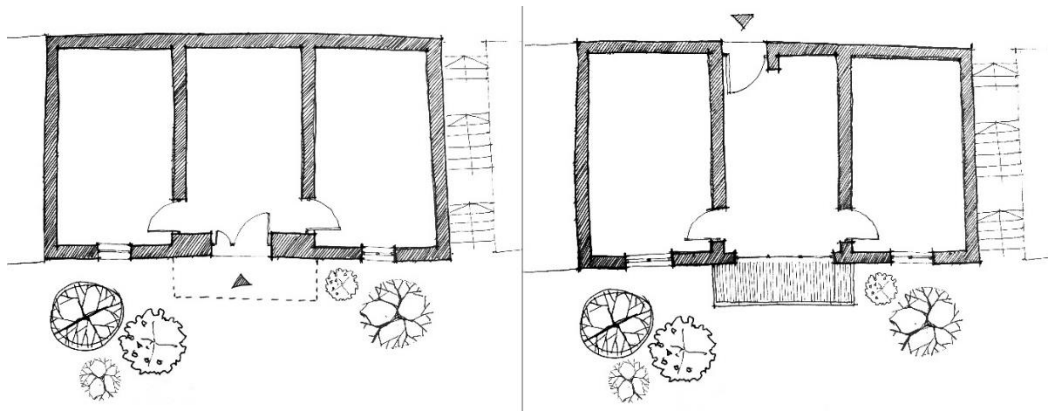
Typical vernacular house plans, Left: Ground floor plan, Right: First floor plan, (Sketch by authors)
